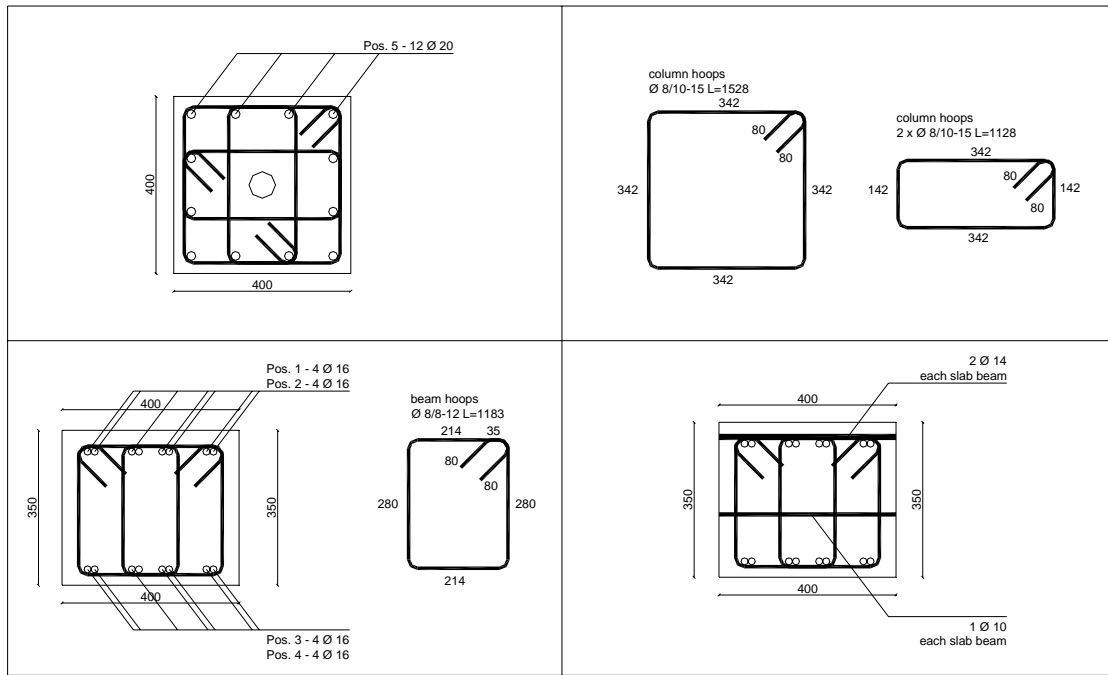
Reinforcement bar detail on the column and beam sections
